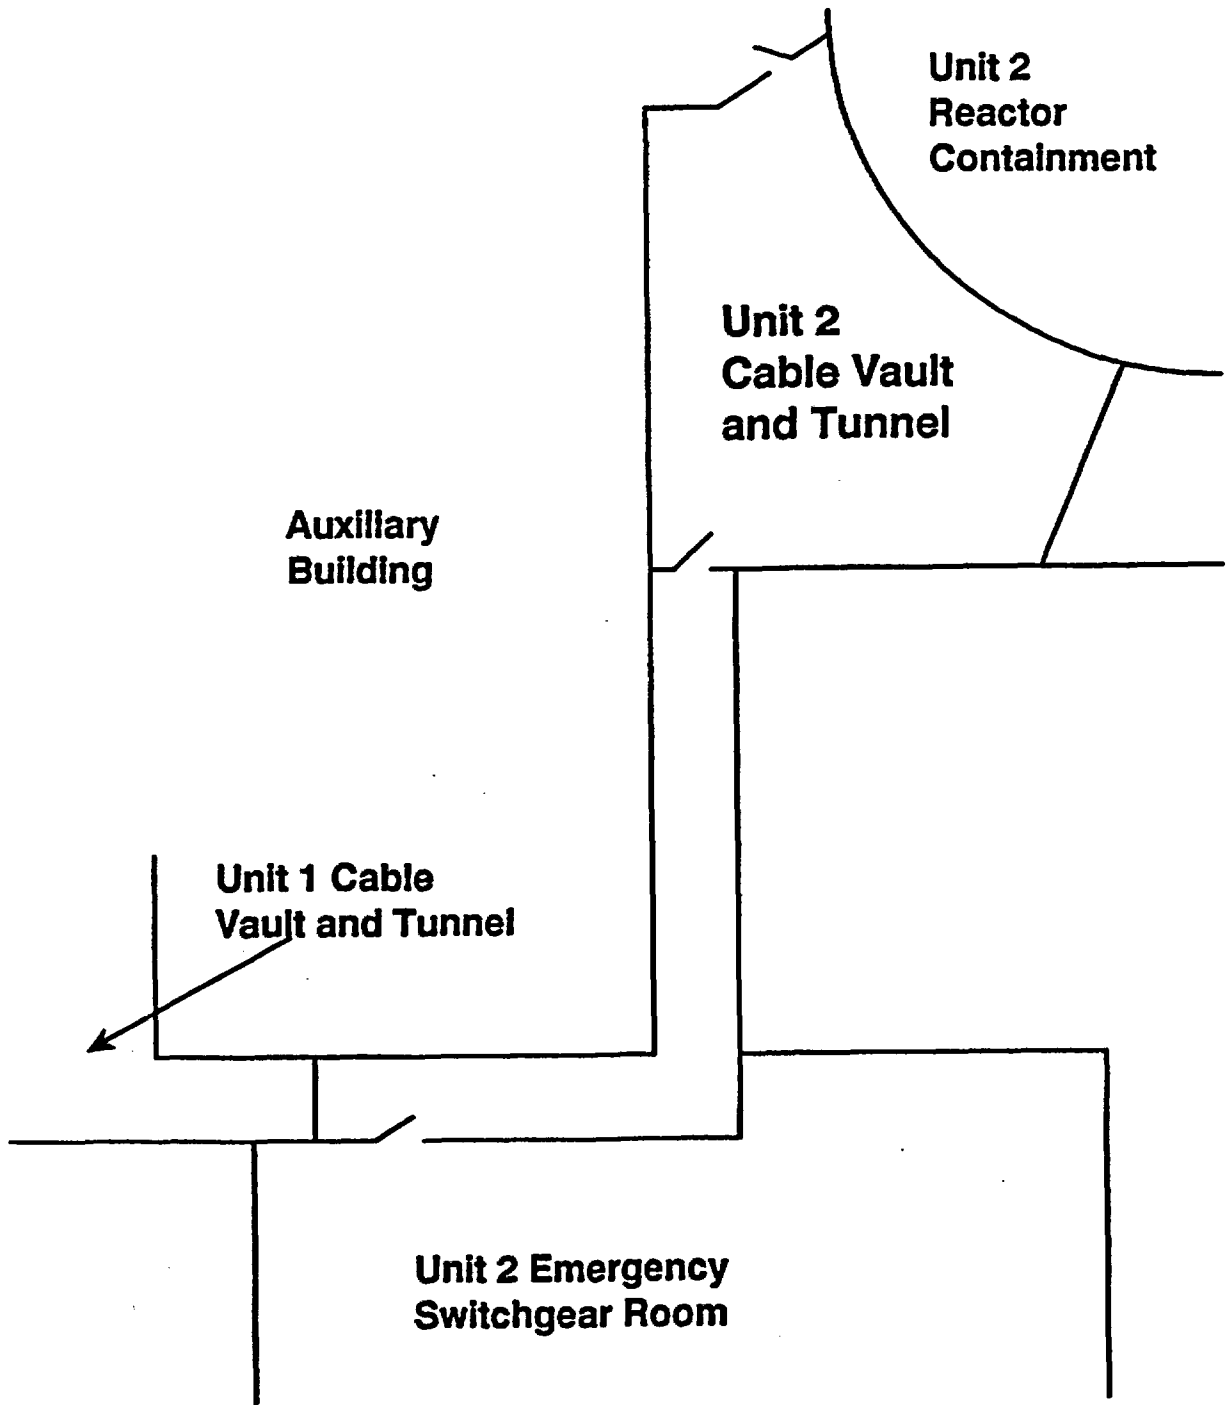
Cable Vault and Tunnel (Fire Zone 2).
